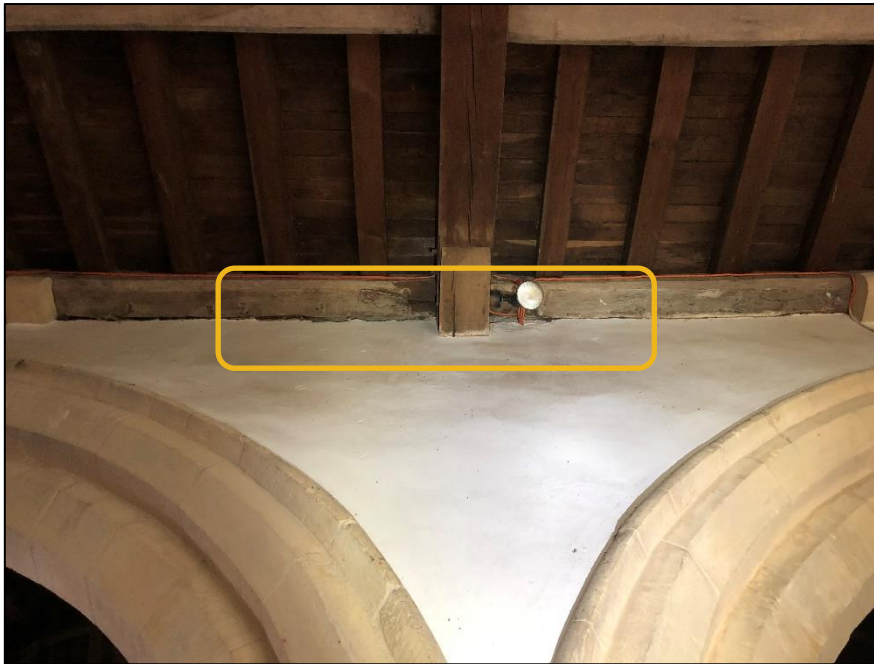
Showing droppings on wall at Location 4 (Figure 5)
